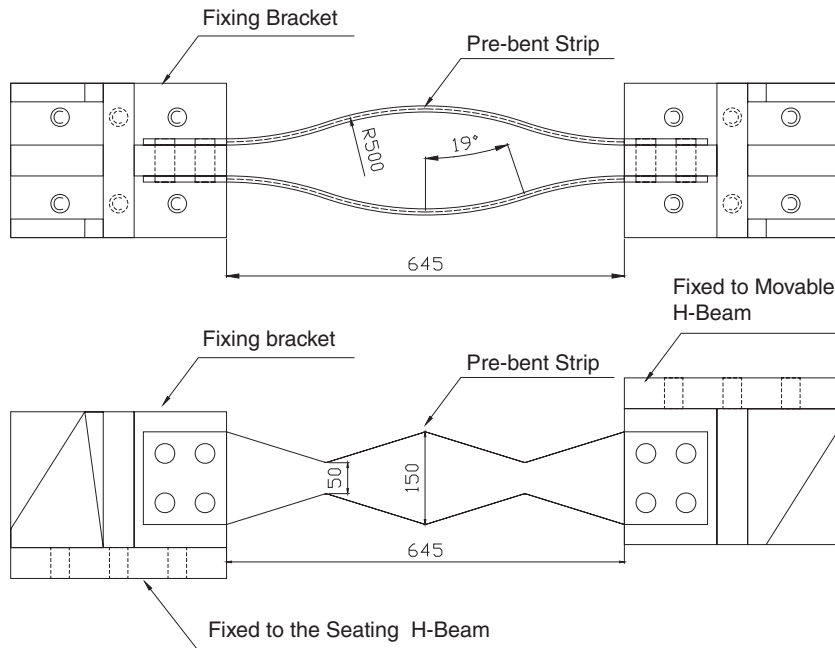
Details of the pre-bent strip pair tested in a non-symmetric layout (unit: mm).
